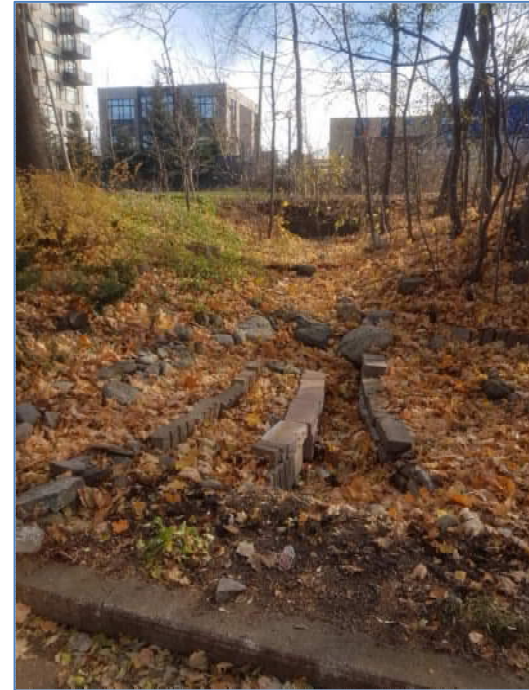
Downstream portion of the first surface drainage feature, south of the Unitarian House, facing south; photo taken November 12, 2020.
